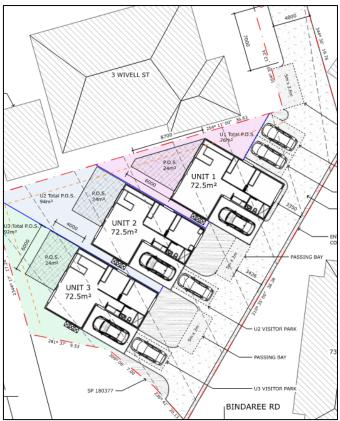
Proposal Plan - Site Plan. Source: Offest Australia
